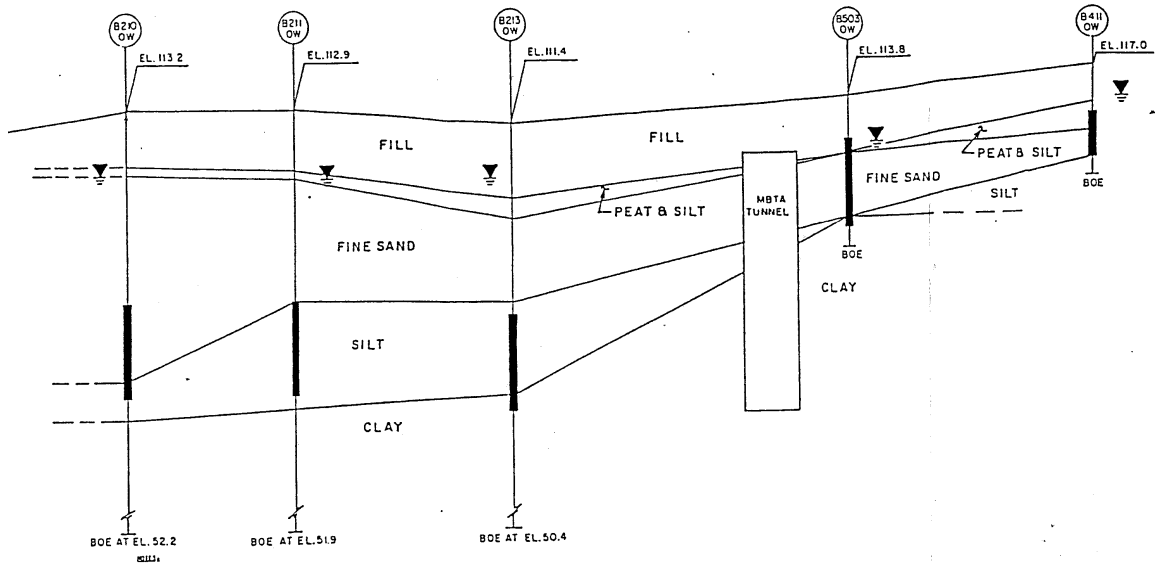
MBTA tunnel location on vertical section at Russell Field.
